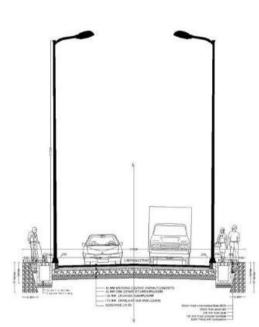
Typical Cross section for 11 m road (section Type B)
